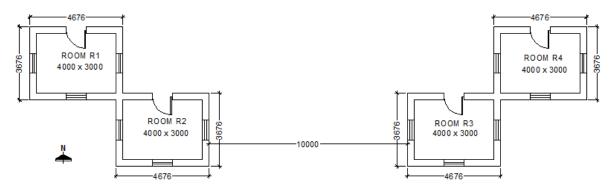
Key plan showing position of rooms (Note: all dimensions are in mm)
